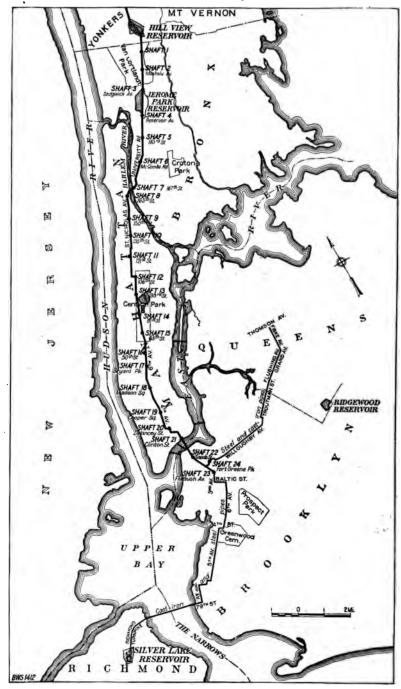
Plan of City Tunnel of Catskill Aqueduct.
